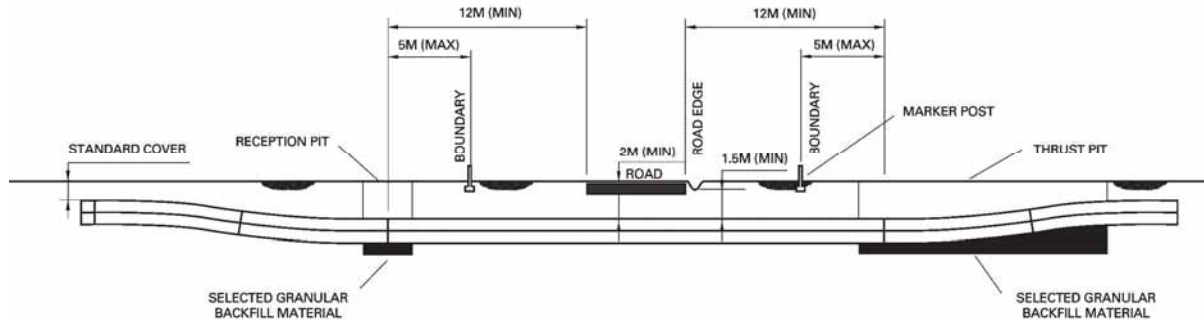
Preliminary Typical Thrust/Auger Bored Road Crossing
